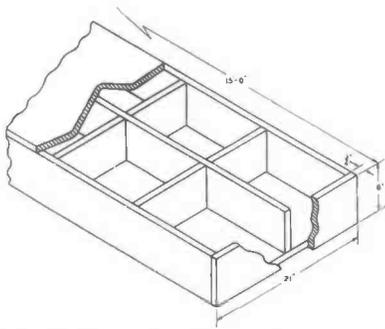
Construction diagram of prefabricated plywood roof panels.
